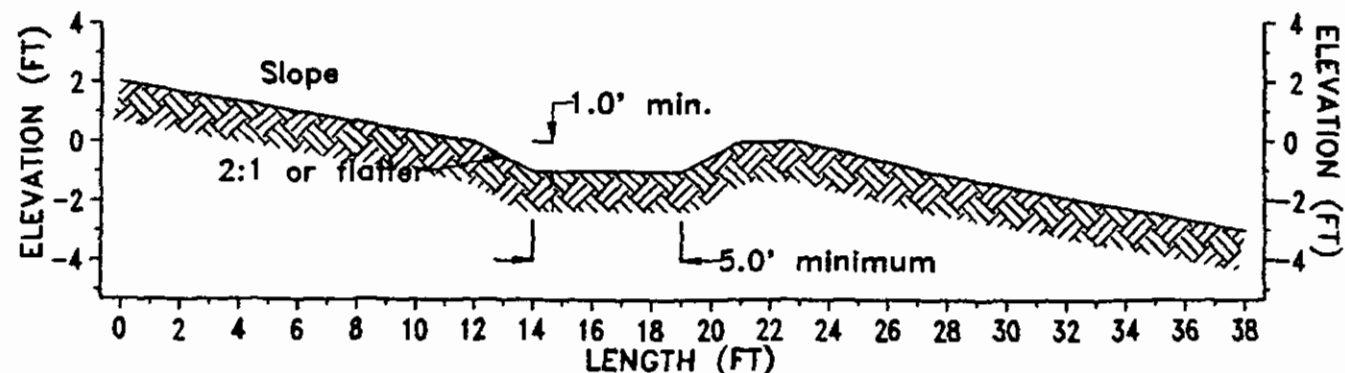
CROSS SECTION OF A TERRACE (TYPICAL)
